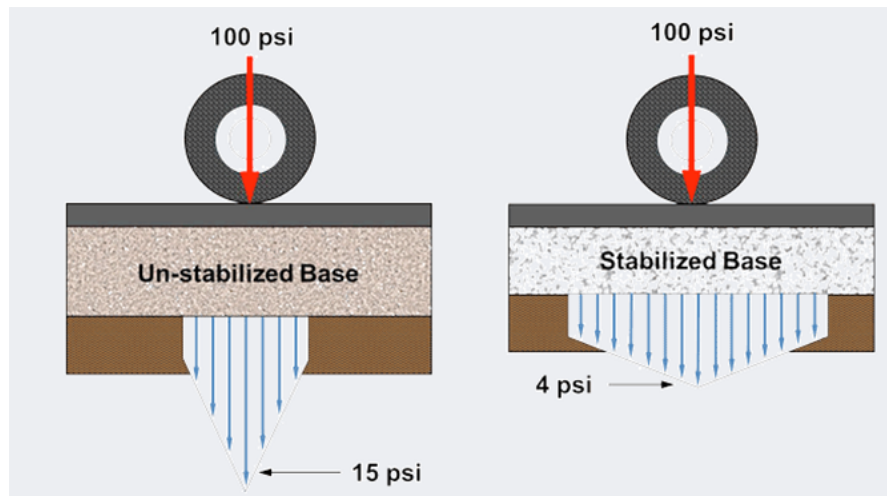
Load distribution under a stabilized and non-stabilized base layer (Ruston Paving, 2021).
